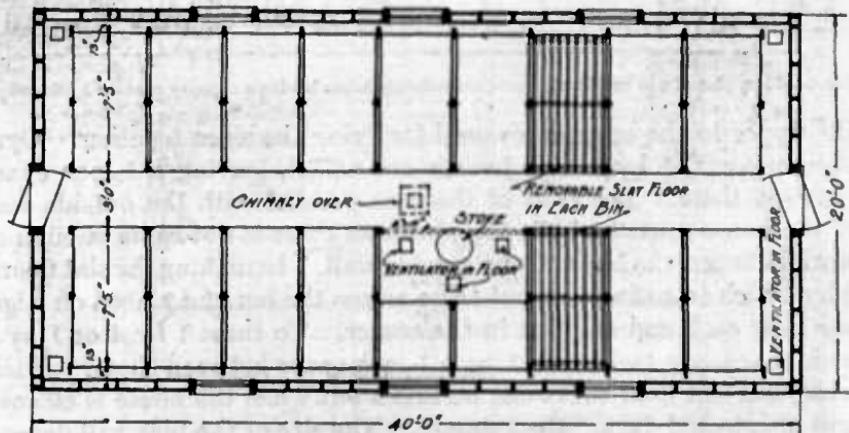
Floor plan of a 20 by 40 foot sweet-potato storage house having a capacity of 2,000 to 2,500 bushels.
